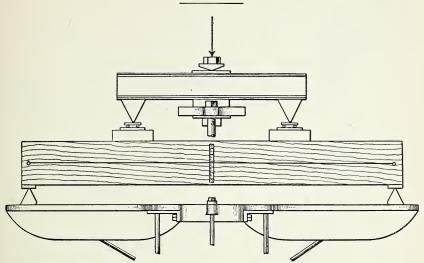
Method of testing large beams under static loading at third-points of the span,
